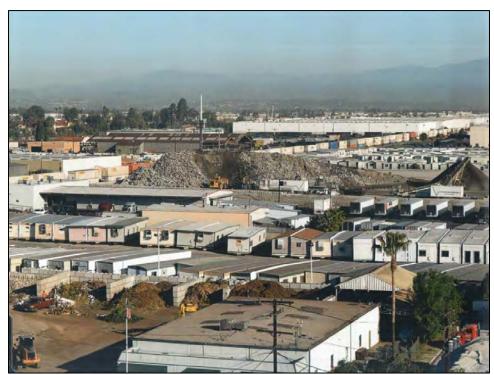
PHOTOGRAPHS OF PROJECT SITE
